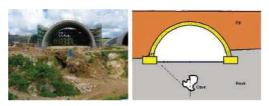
The design of arch protection structure on karstic caves at New Ishigaki Airport.
